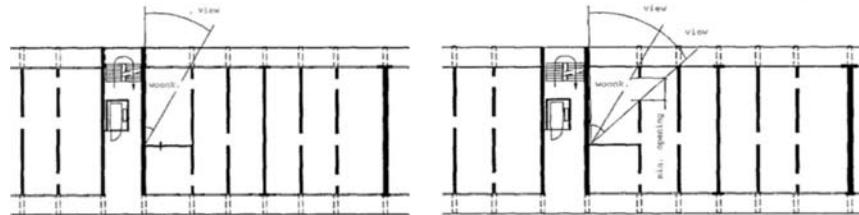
Original plan with limited view to the outside (left); Proposal for extended view and opening of the division wall (right)
